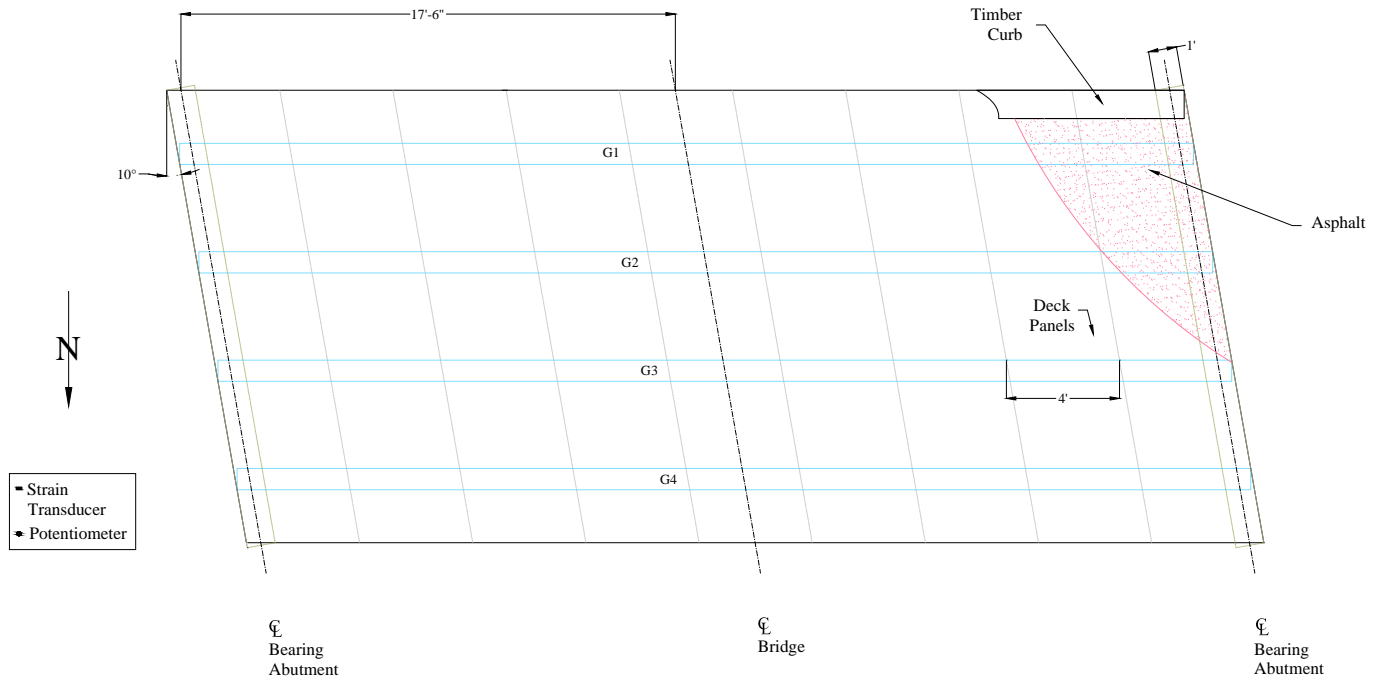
Plan and Profile Layout of Trapper Creek Bridge
